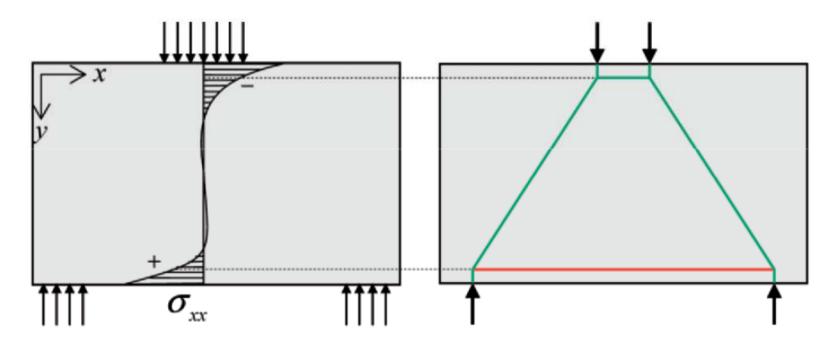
Foundation block. Stresses and strut-and-tie scheme.
